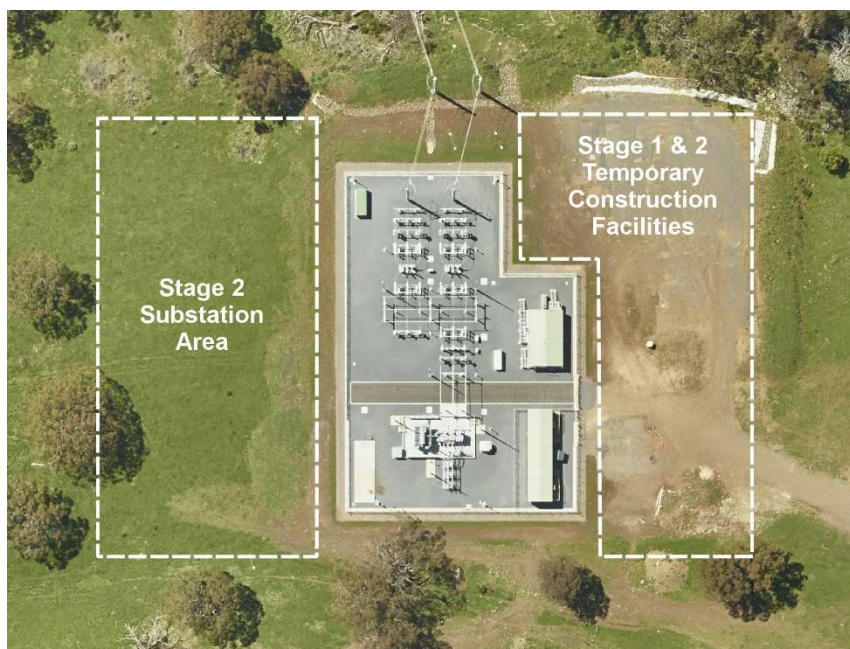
Indicative expanded substation layout to integrate Stage 2 facilities
